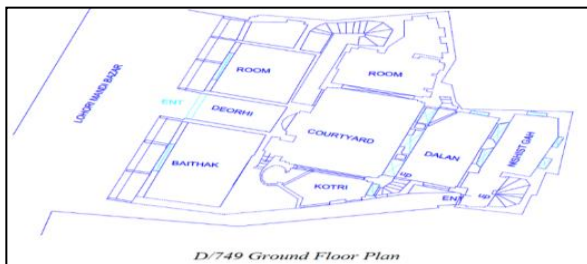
Location Plans of House No.D/749 (Source: Authors)
